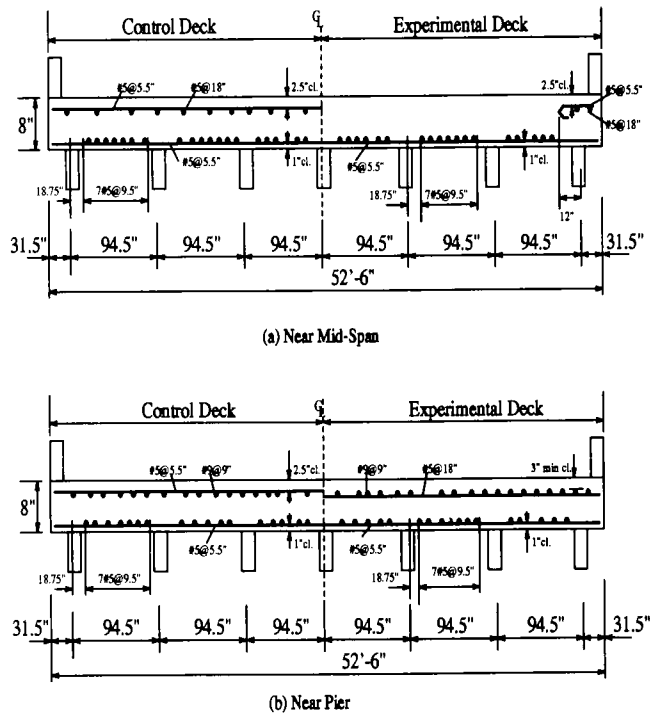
Reinforcing steel details for the bridge deck (not to scale; 1 in. = 25.4 mm).
